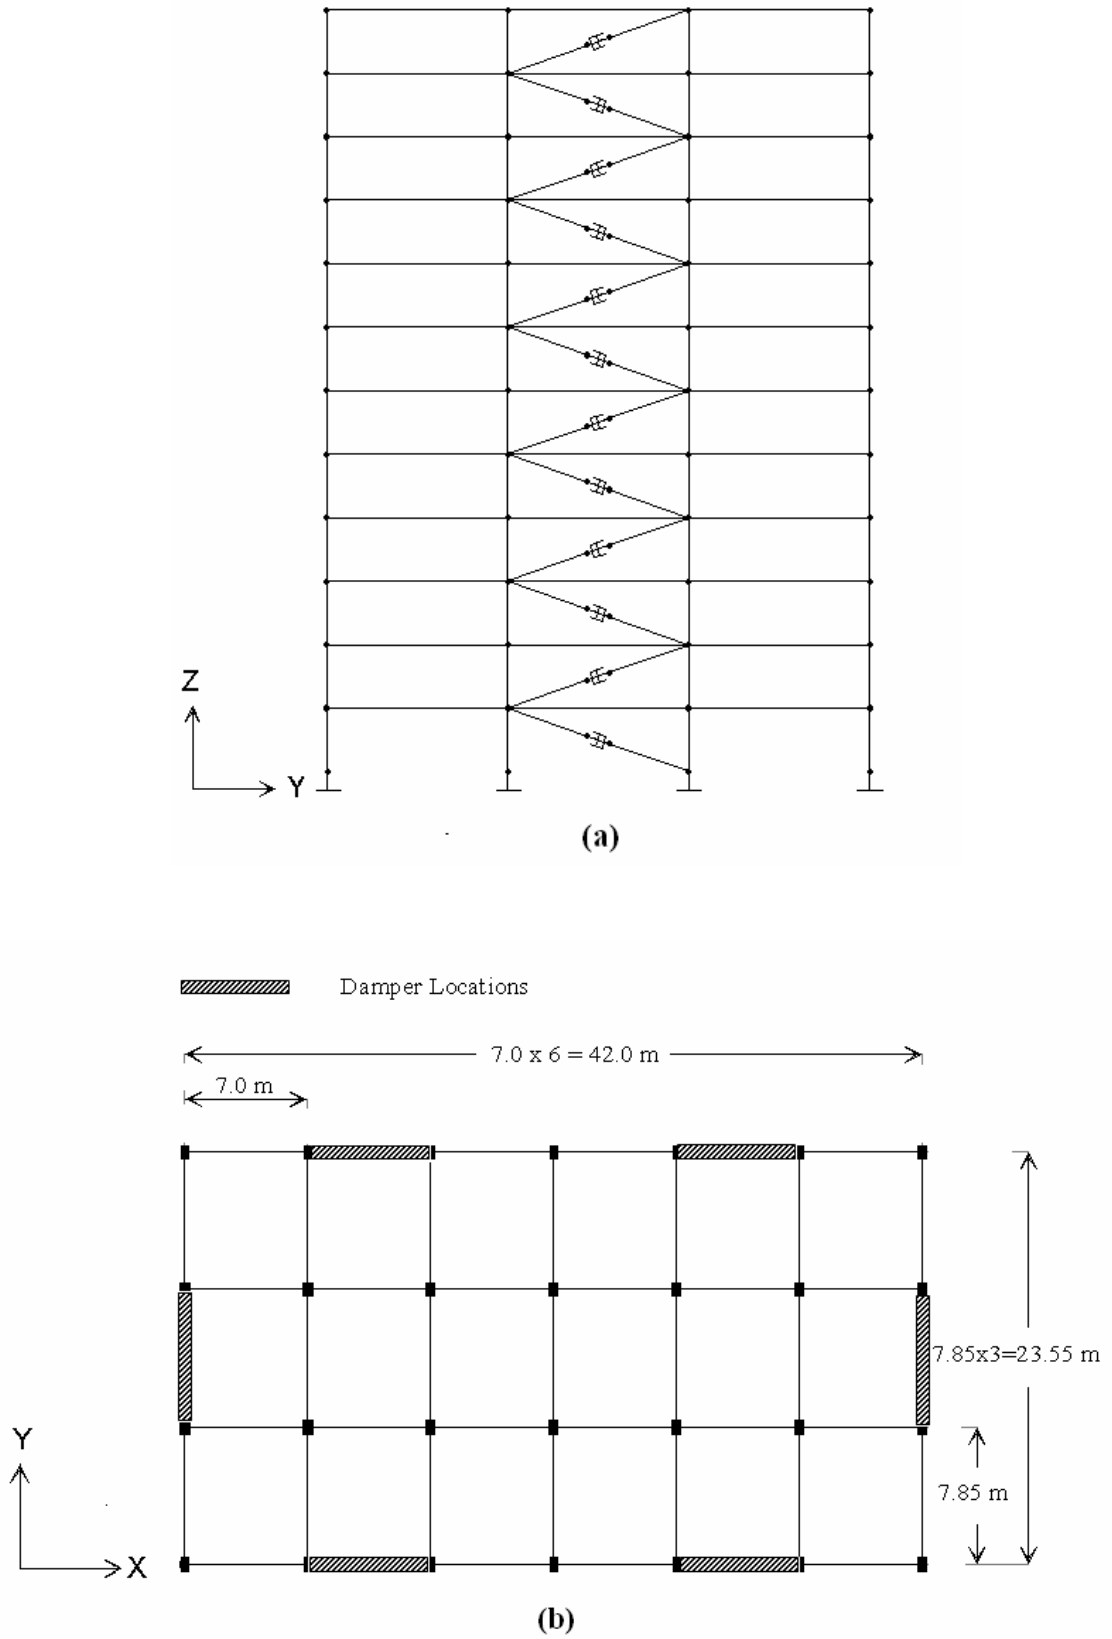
Location of PFVD system: a) elevation, b) floor plan view
